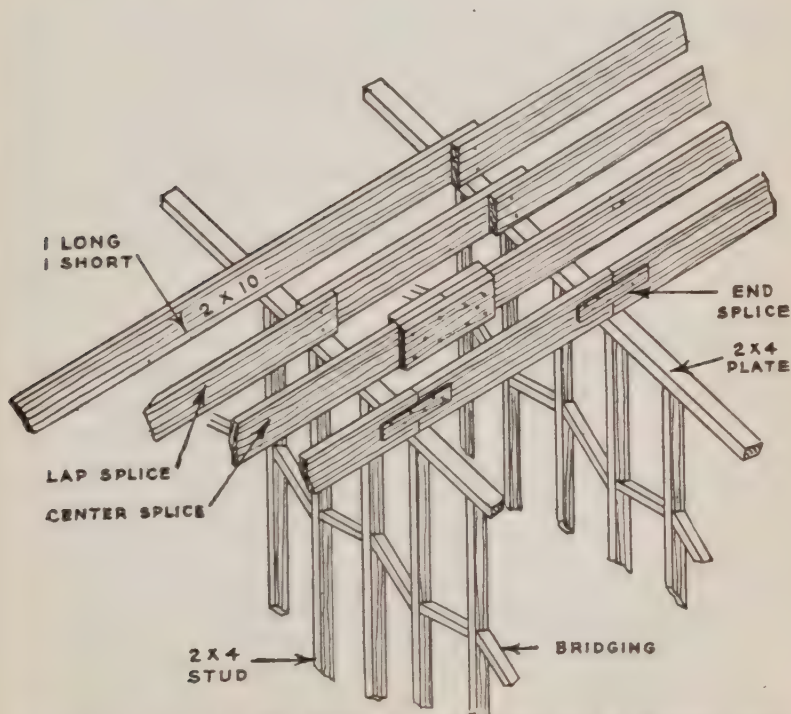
,903.—Double hall partitions showing how timbers (joists) may be lengthened, bearing upon them. The lapping method is best for all purposes, but when there is an under or rough first floor laid, butt end joints are just as good and are better for lathing.
